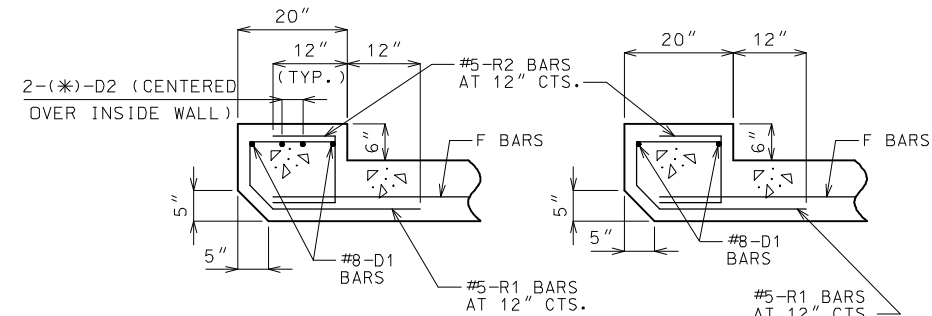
DETAIL OF TRANSVERSE JOINT THRU BARREL OF CULVERT
